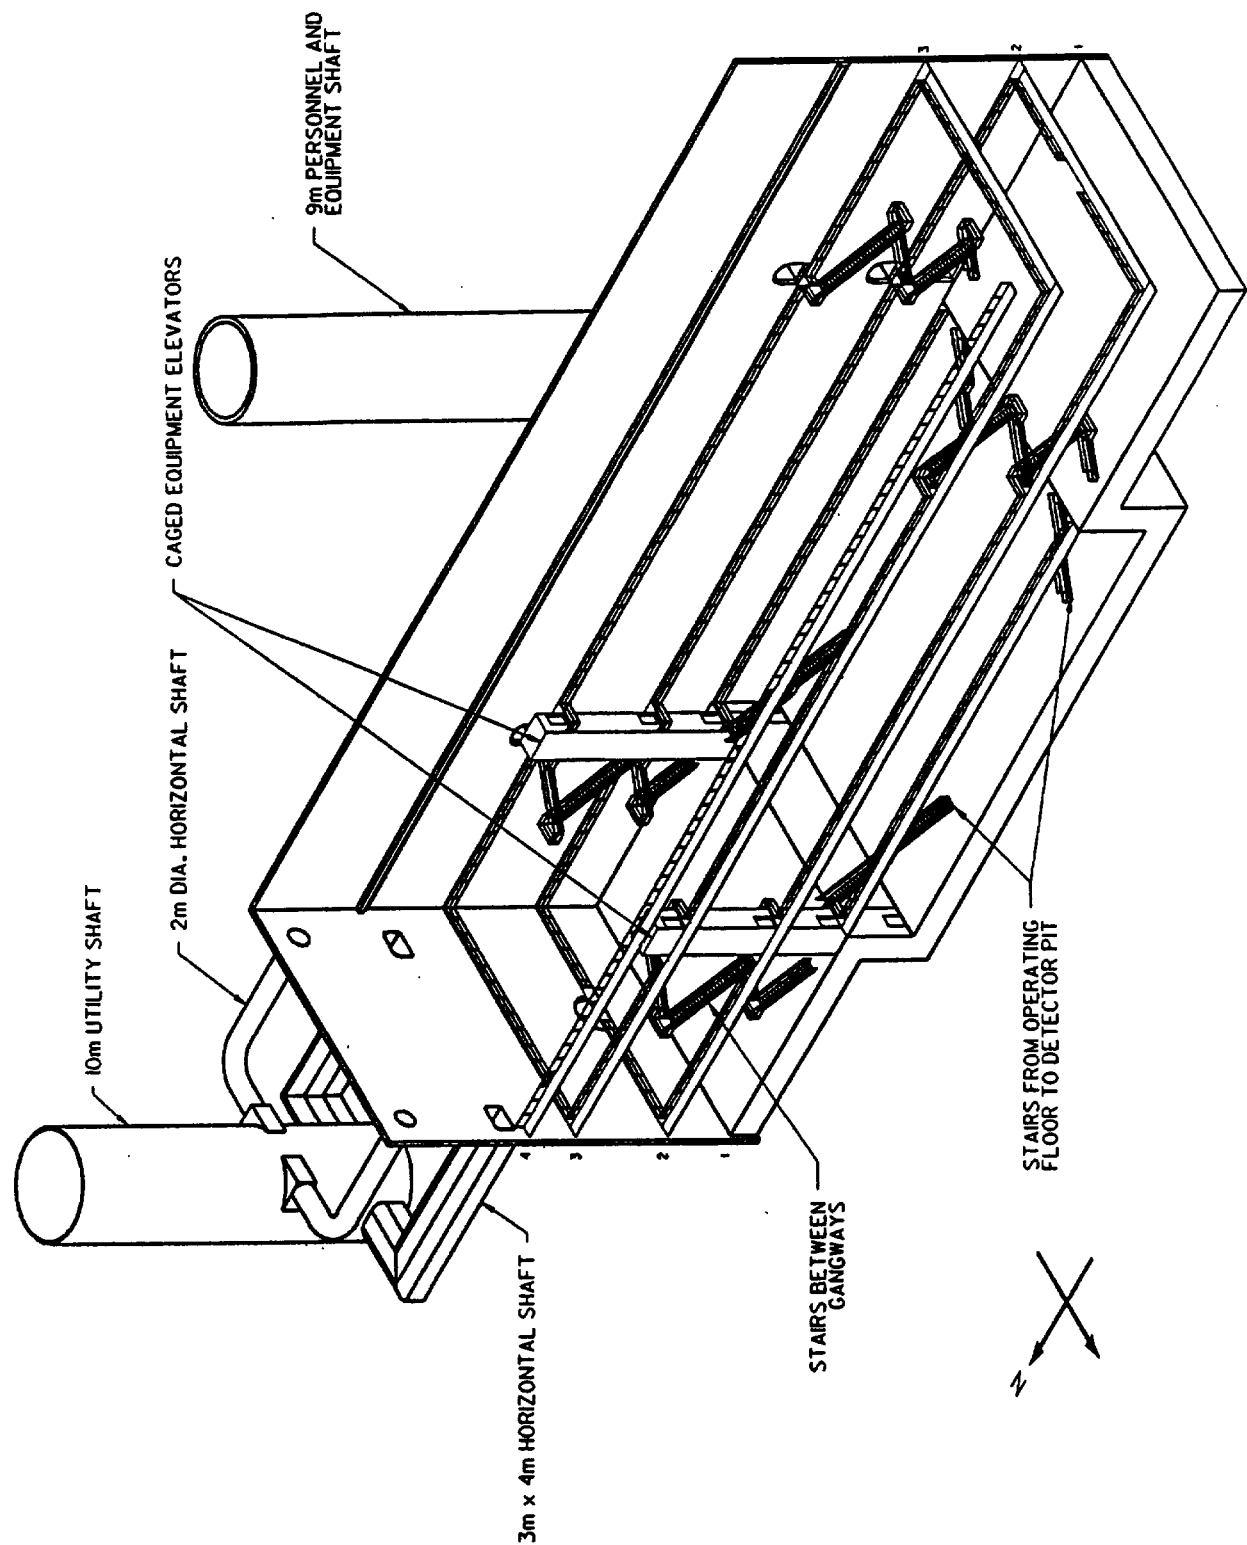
Isometric view of the SDC underground hall showing gangways and access points.
